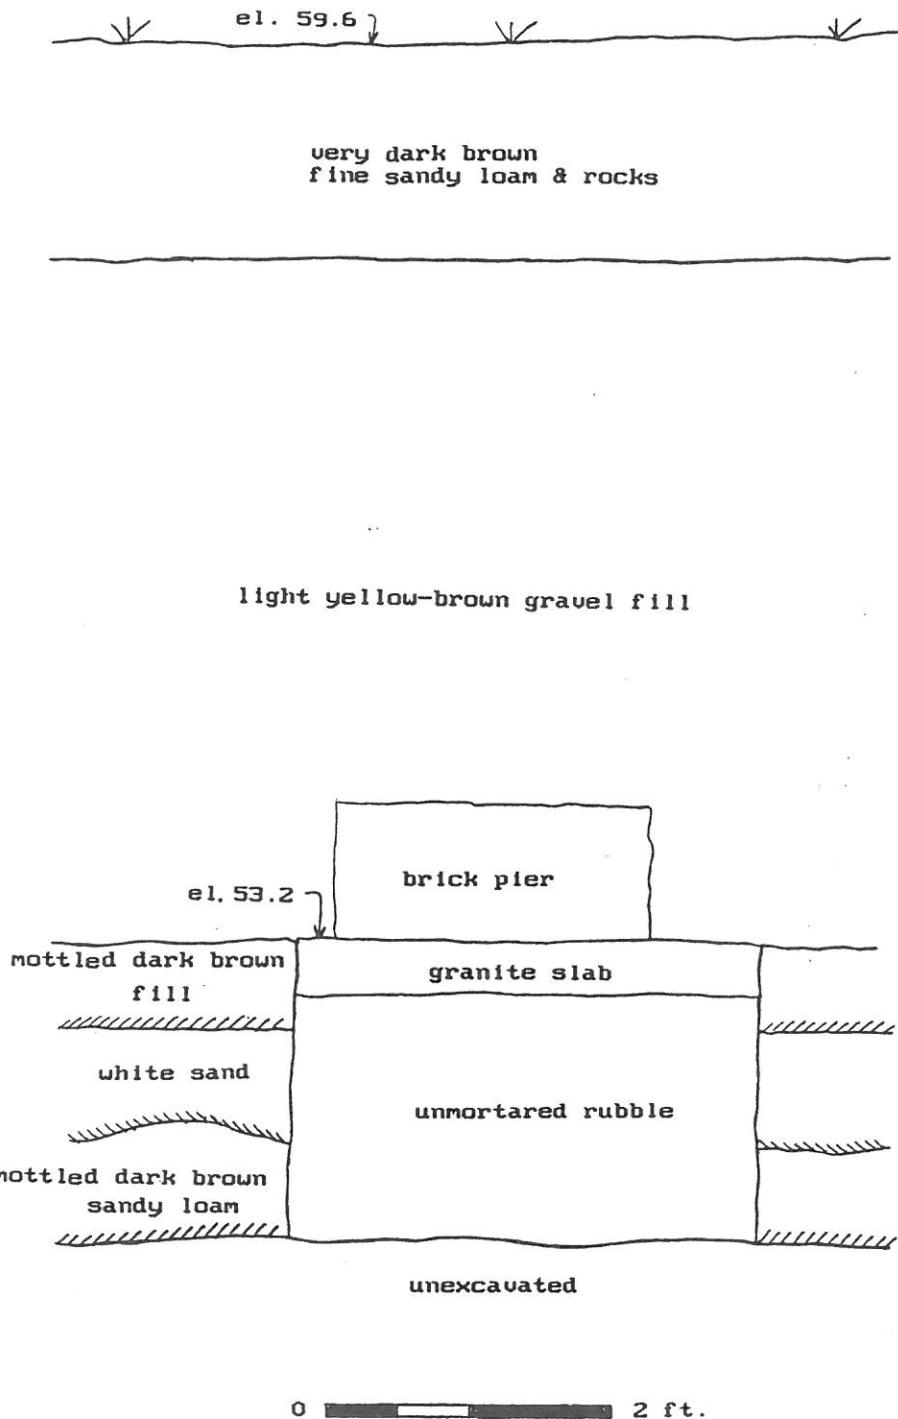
SECTION OF TRENCH 1 WITH BURIED HEADRACE WALL TOP AND BRICK PIER
